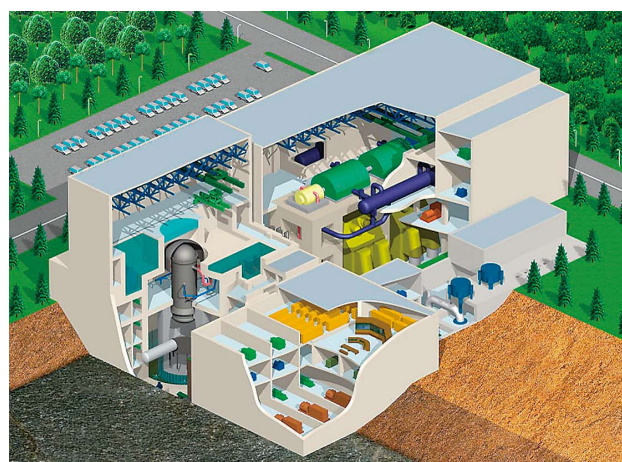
Cutaway Drawing of ABWR-900 Plant.
